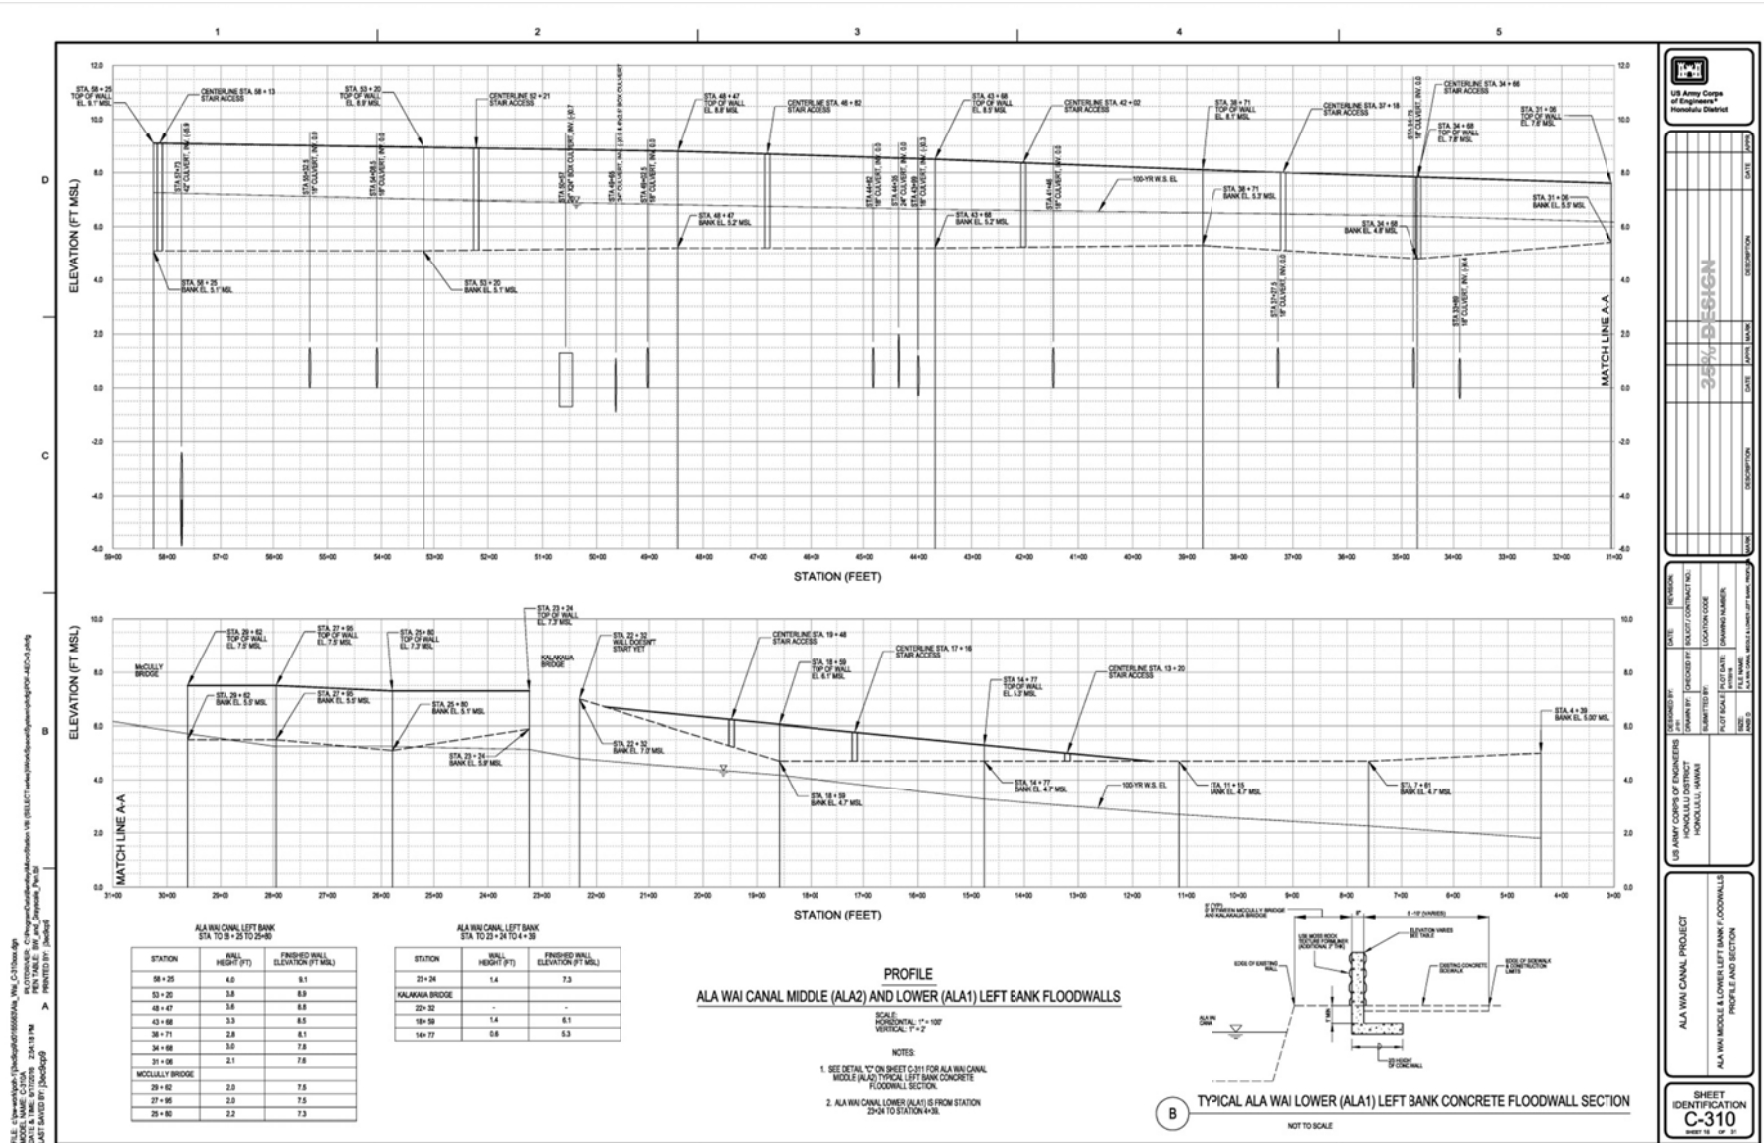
Ala Wai Canal Middle and Lower Left Bank Floodwalls Design Plan.
